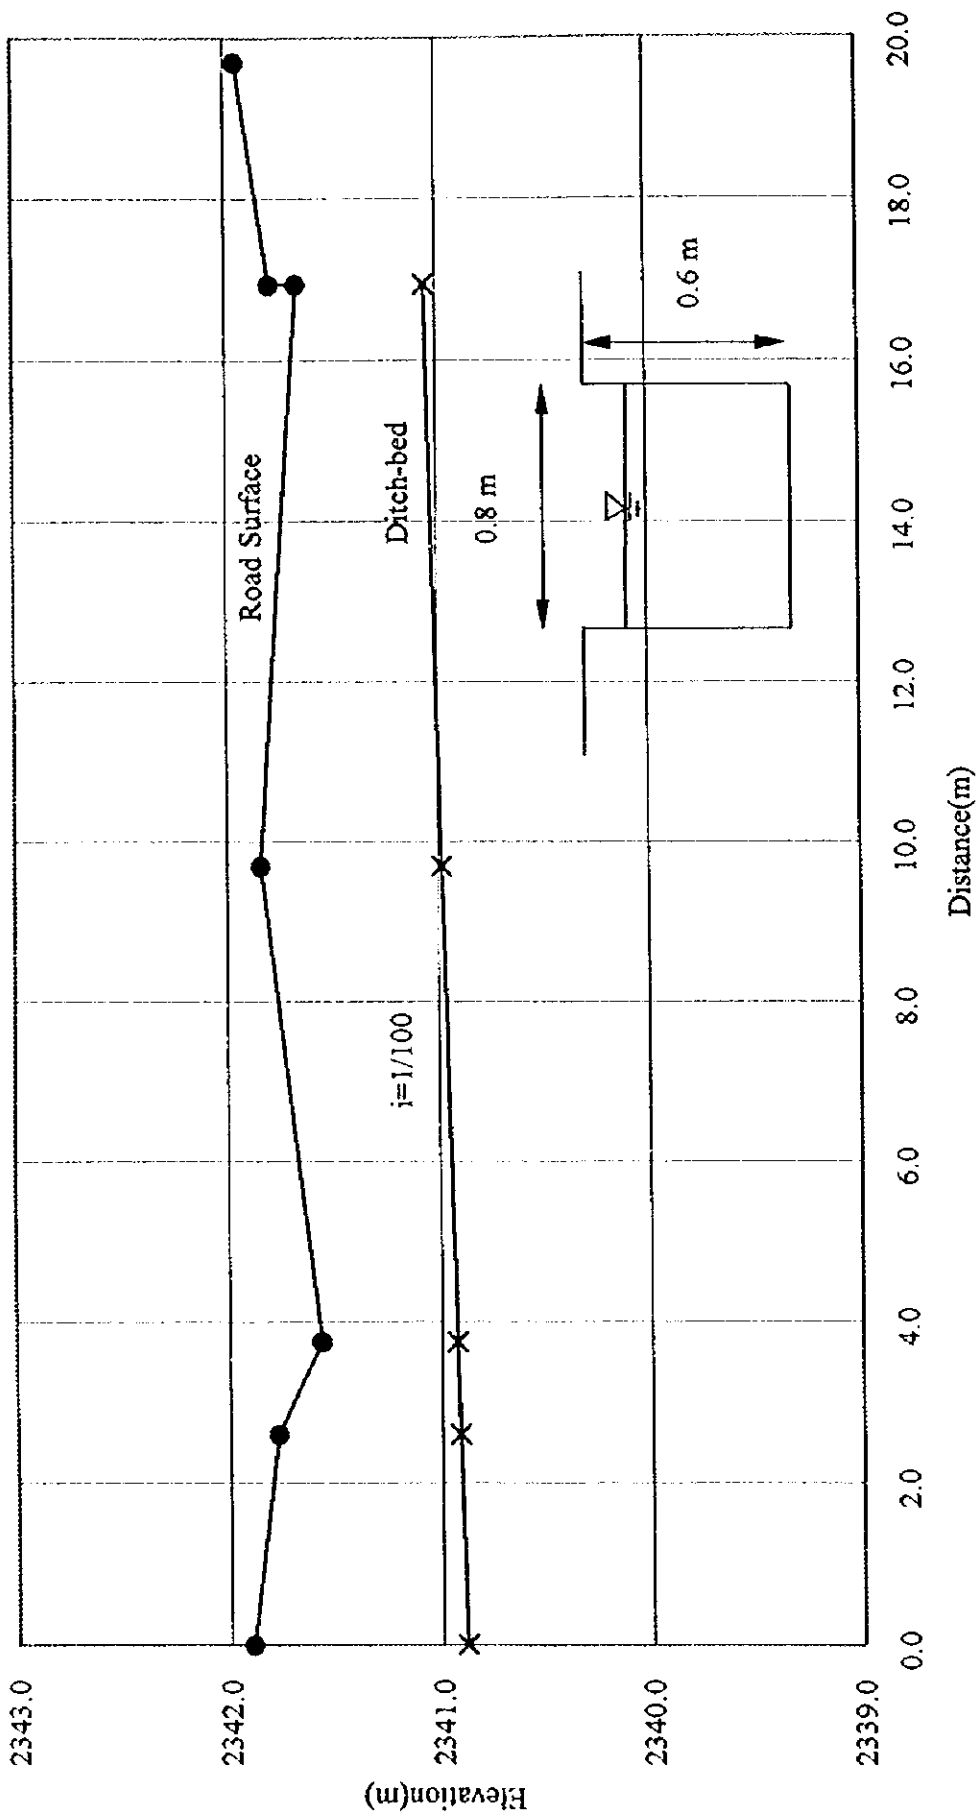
Longitudinal and Cross-sectional Profiles of Drainage Ditch for E1 Basin
